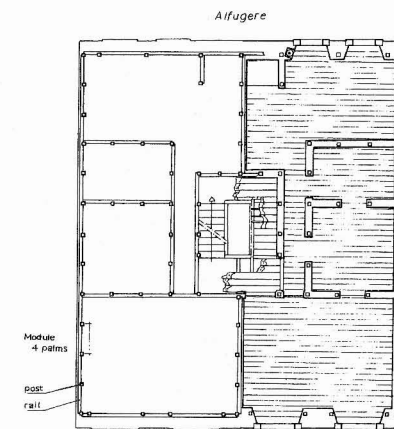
Modular Planning: Floor plan of no.75 Conceição Street. (Drawing by Jorge Mascarenhas).
